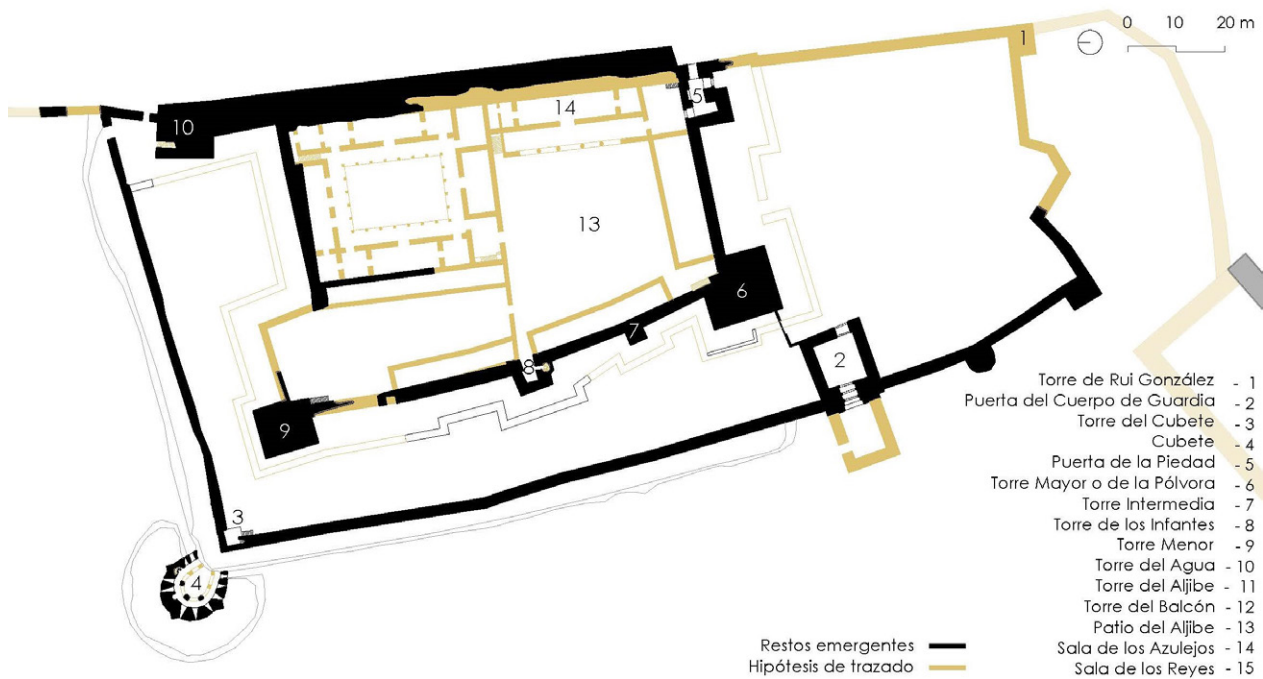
Ground floor plan of the Alcázar. Source: the authors.
